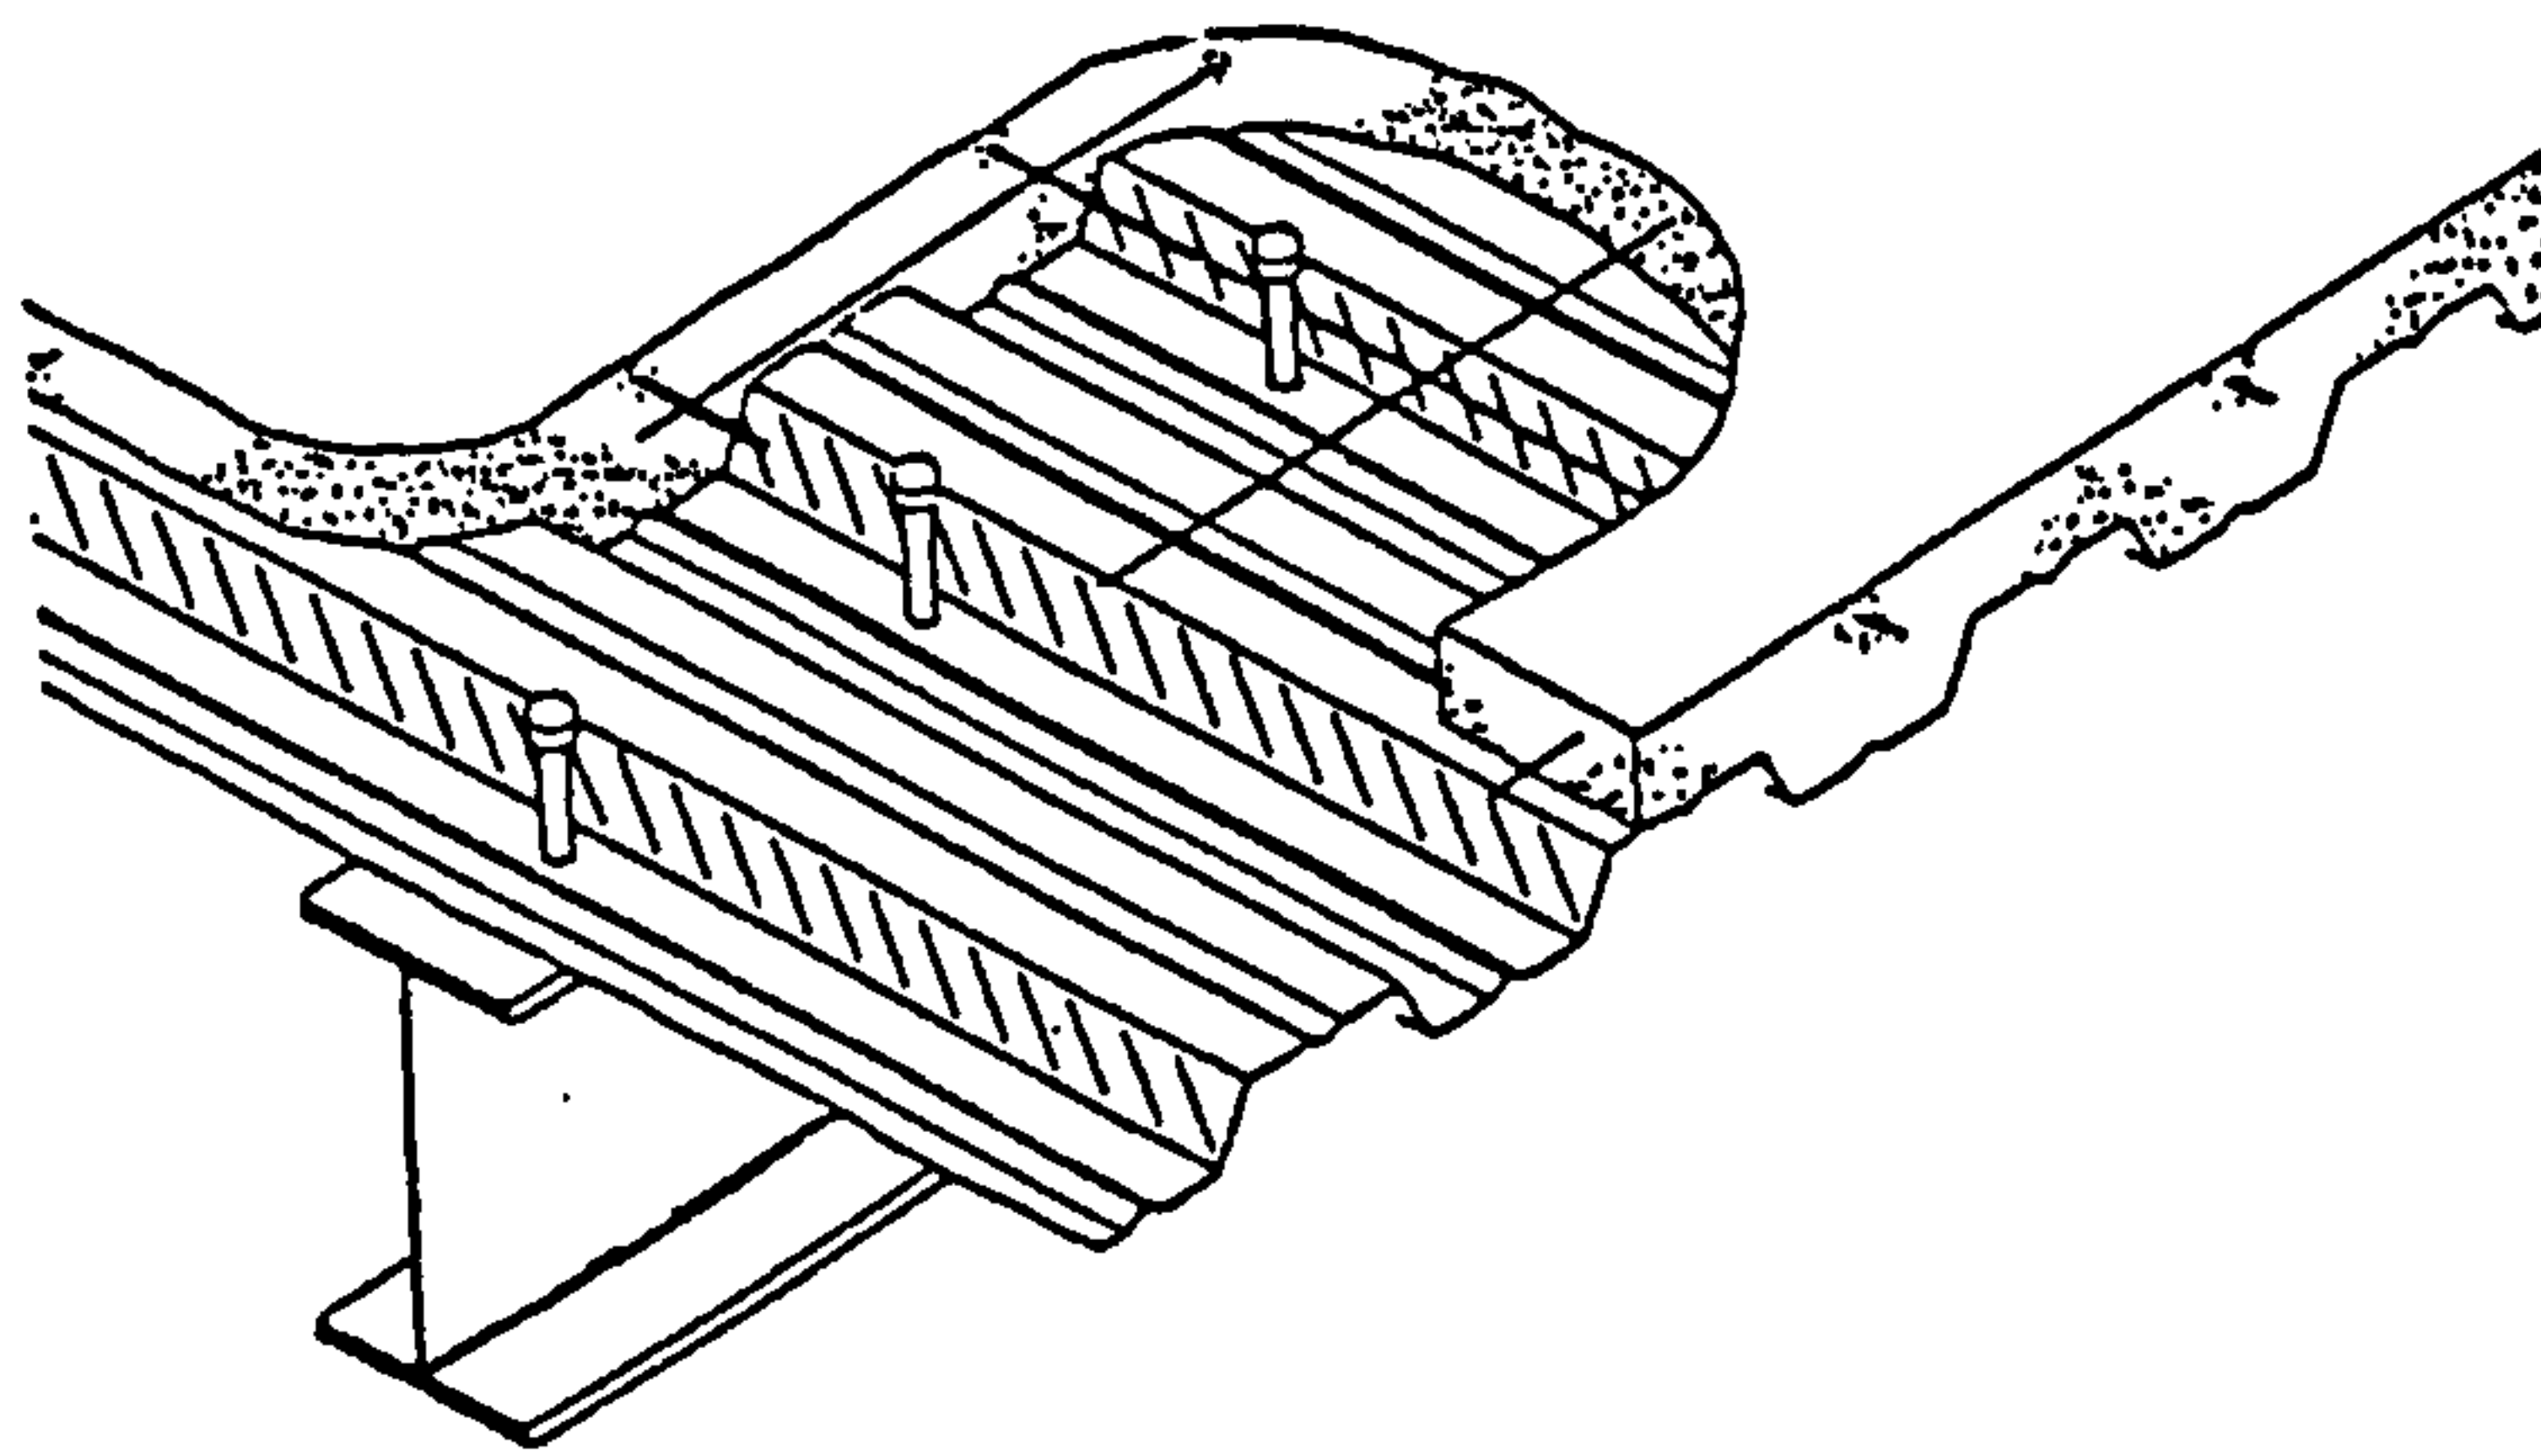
Basic components of the composite floor system [Newman G M, 1989]
